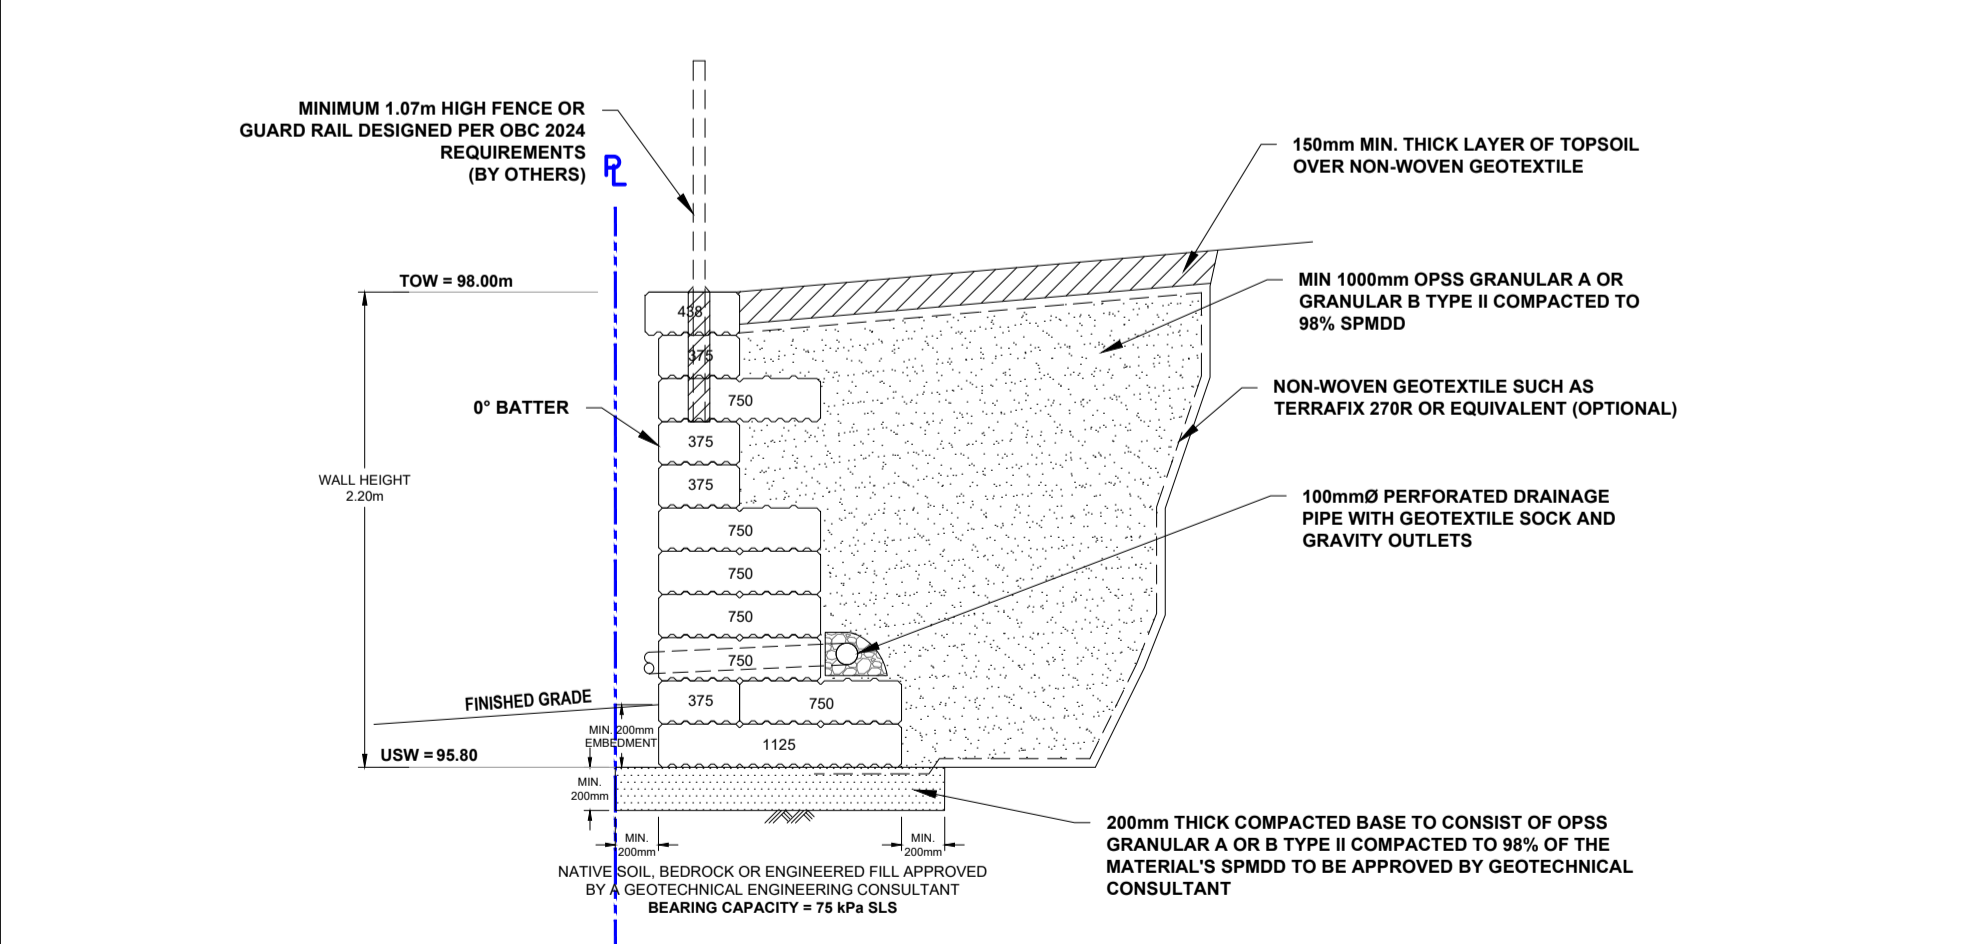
GR1-GR3 OVERLAP DETAILS:
